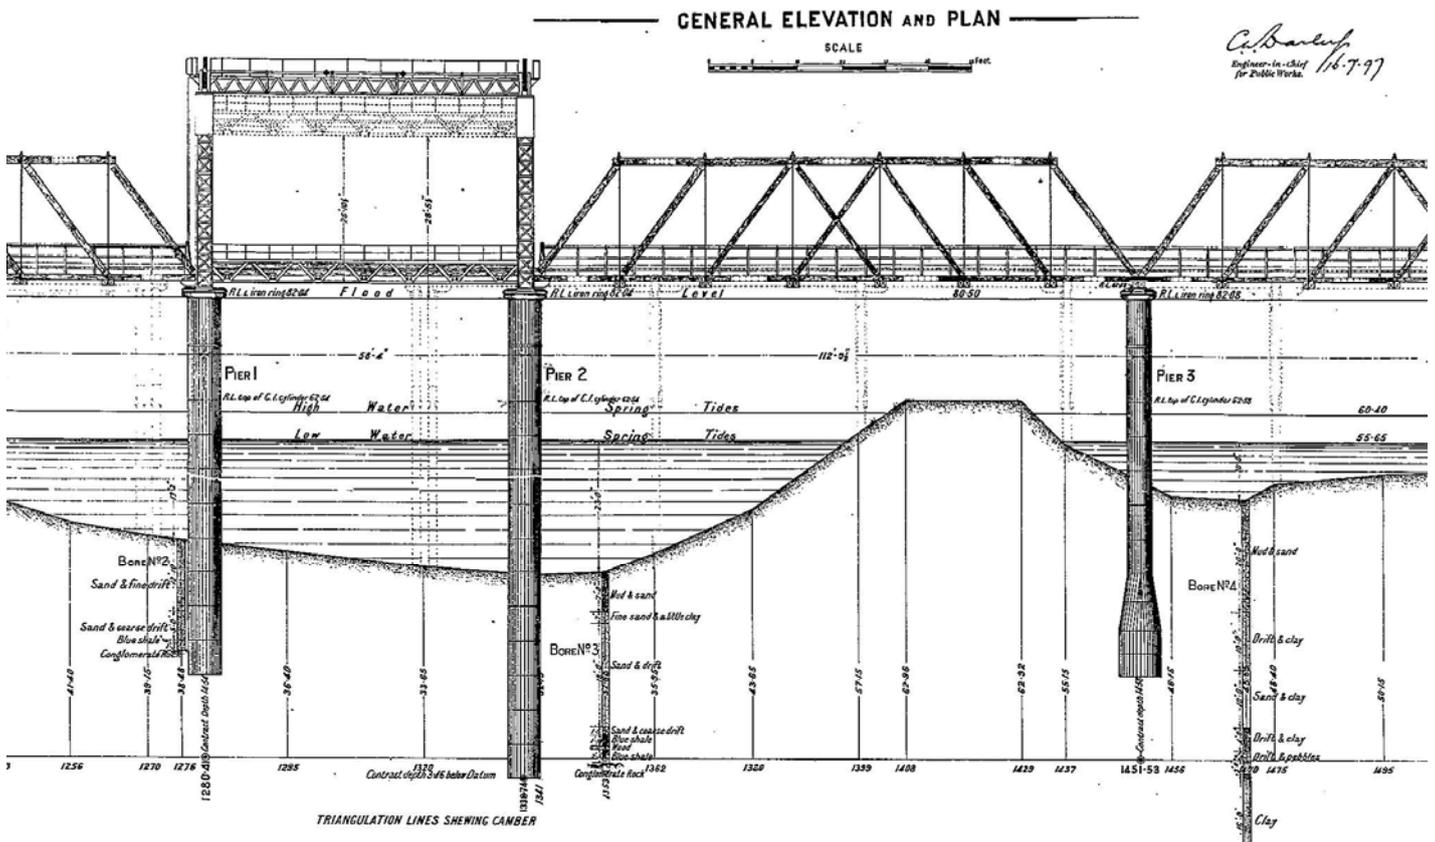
Extract from historic plans of Dunmore Bridge at Woodville.
